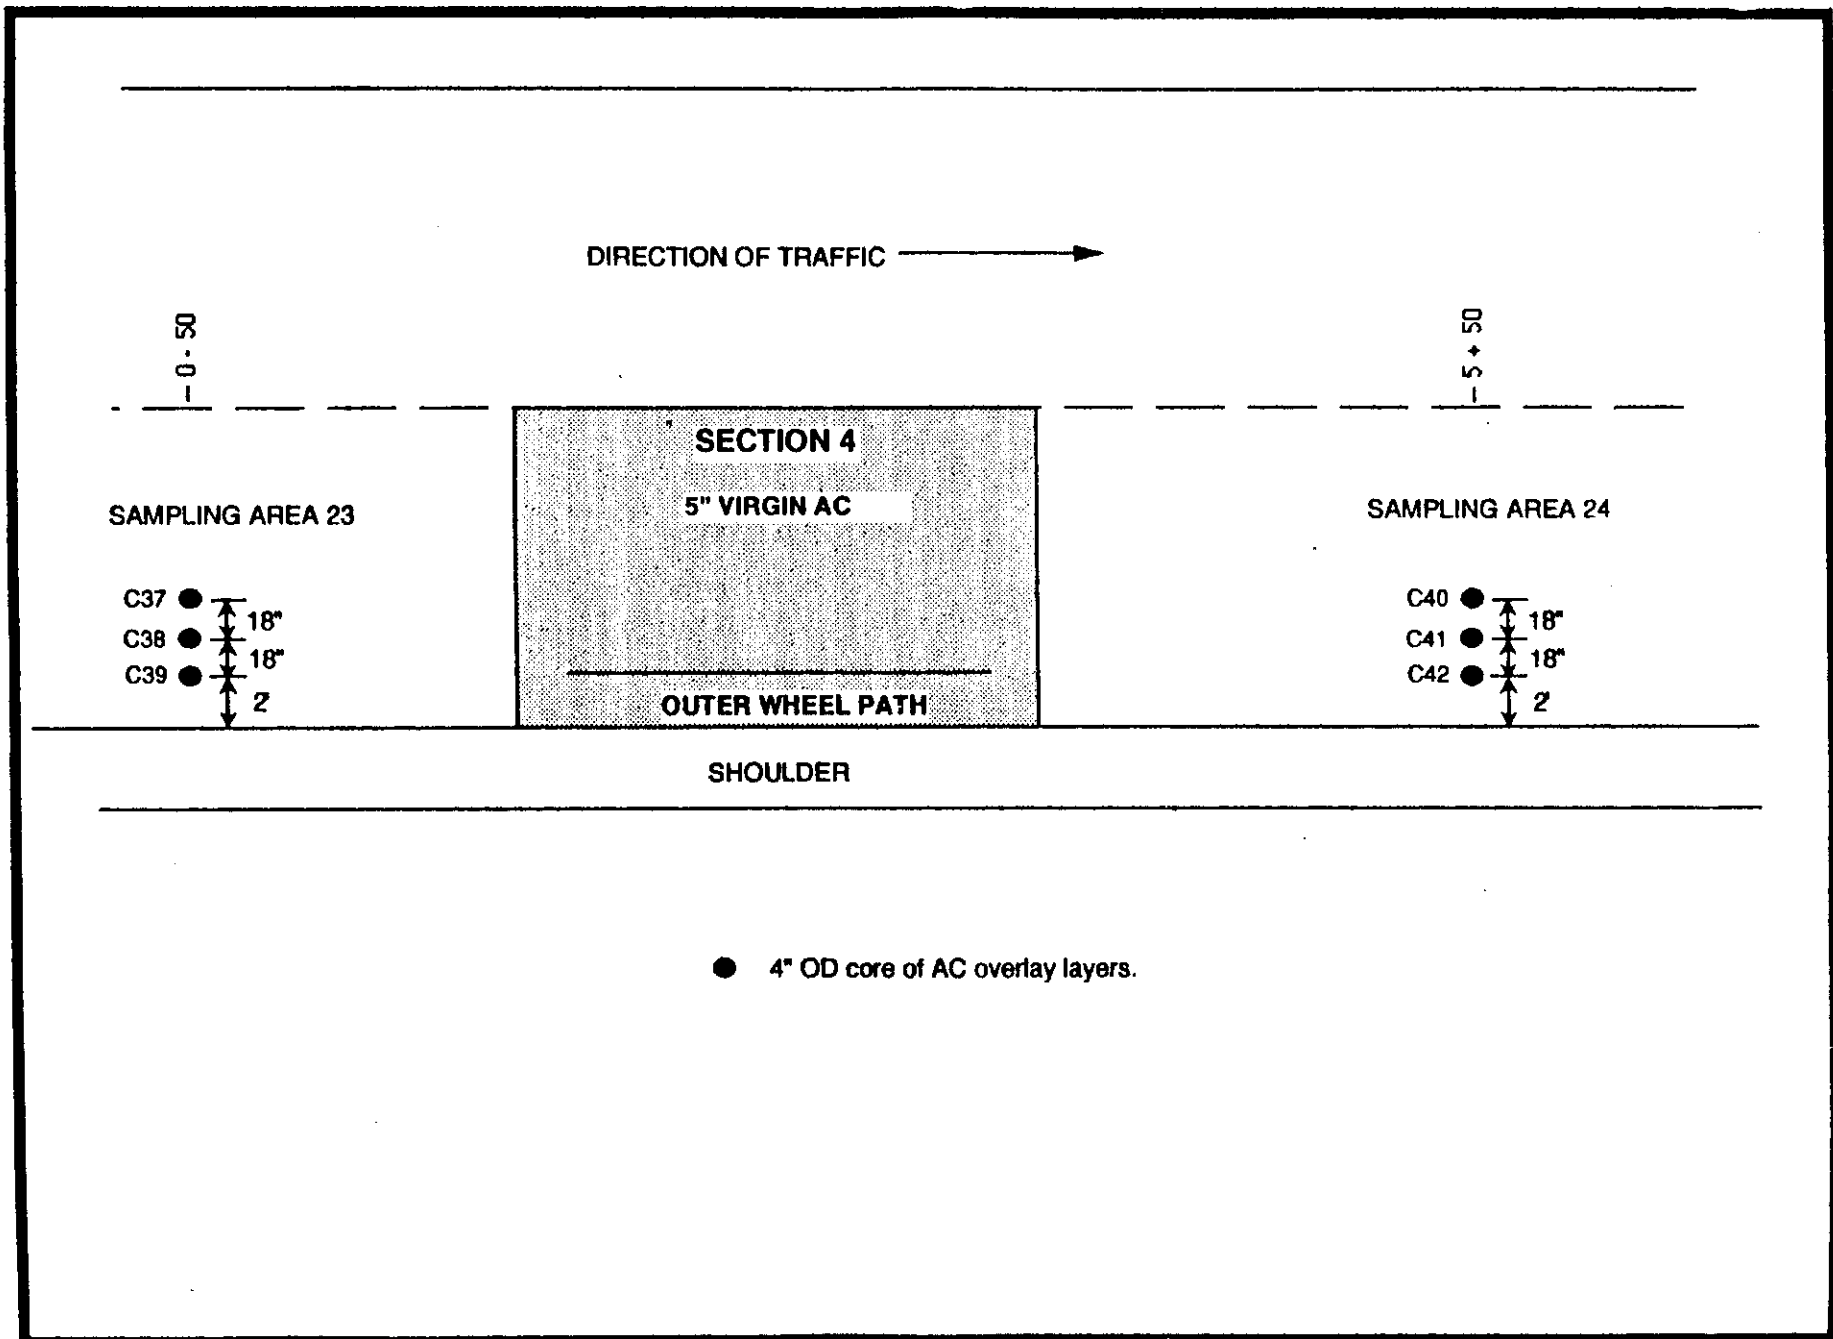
Example of "Post-Construction" Sampling Plan for Section 4.
